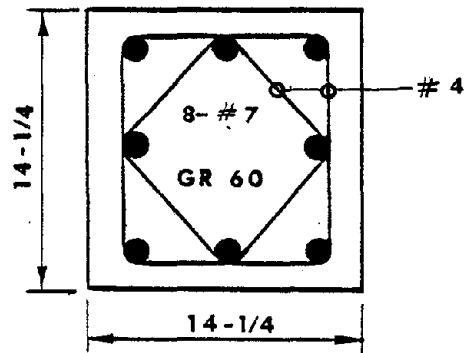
(contd.) Beam and Column Cross Sections and Reinforcement Details
